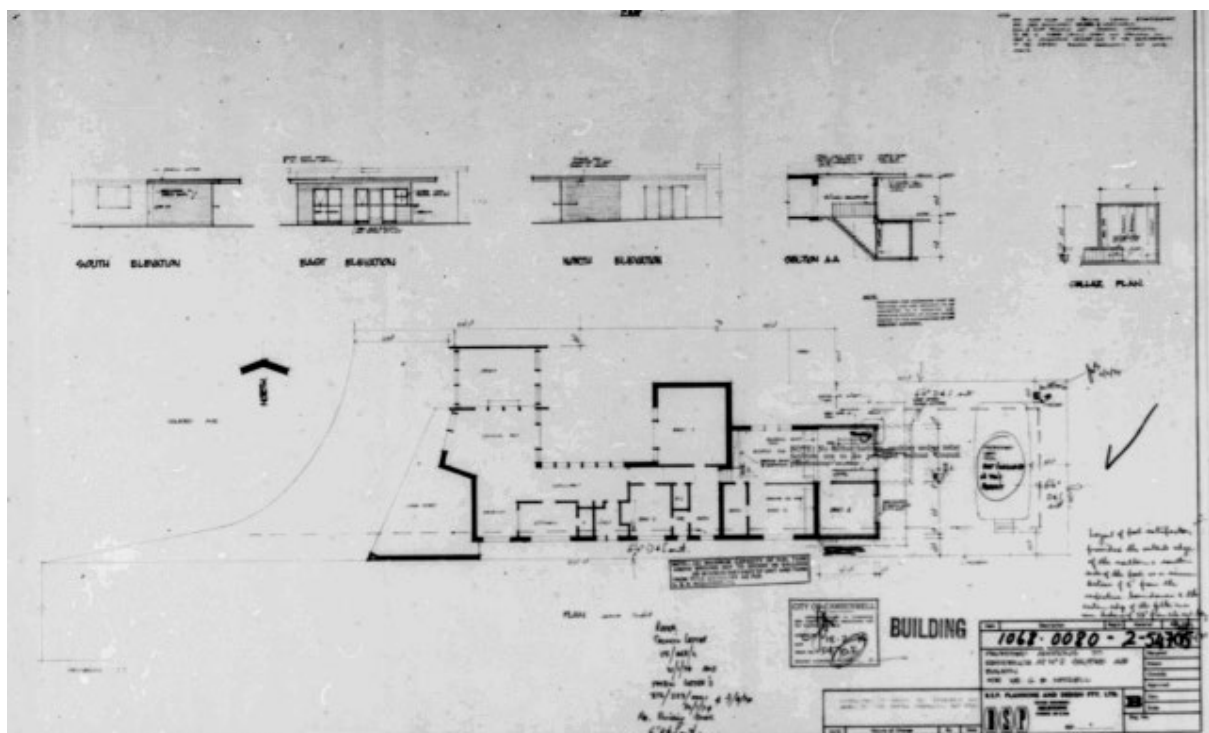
Working drawing showing addition of a bedroom, cellar and extension to rumpus room in 1974 at the rear of the house. (Source: BP 54705)
